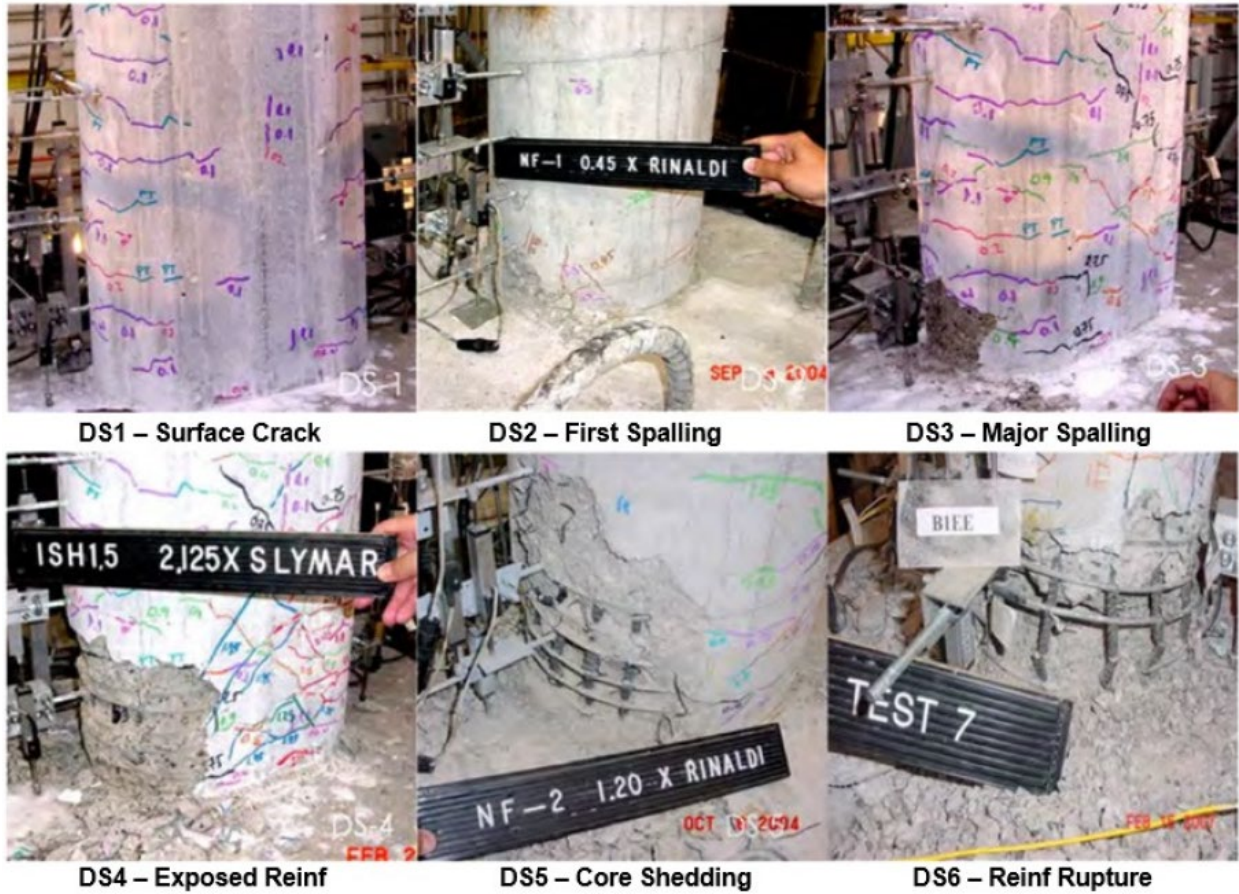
Damage States for Bridge Columns (Saini and Saiidi, 2014)
